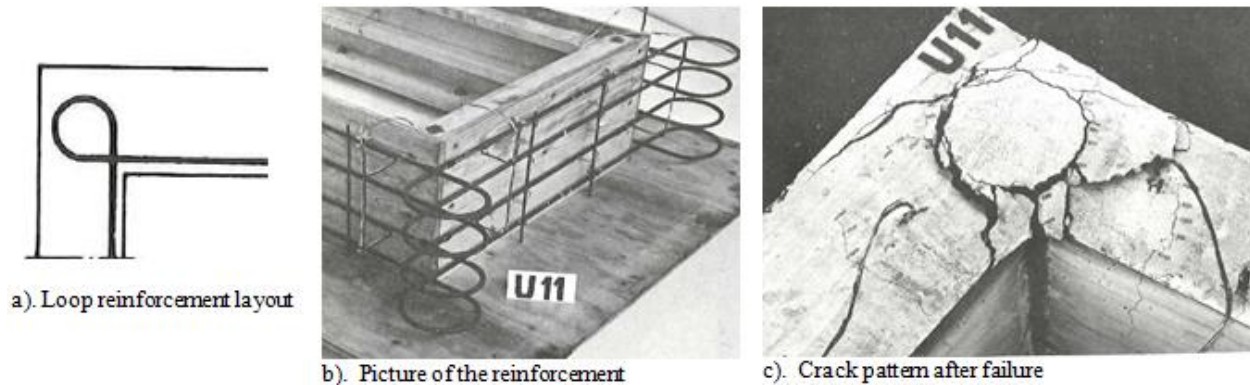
The loop reinforcement layout (Nilsson, 1973)
